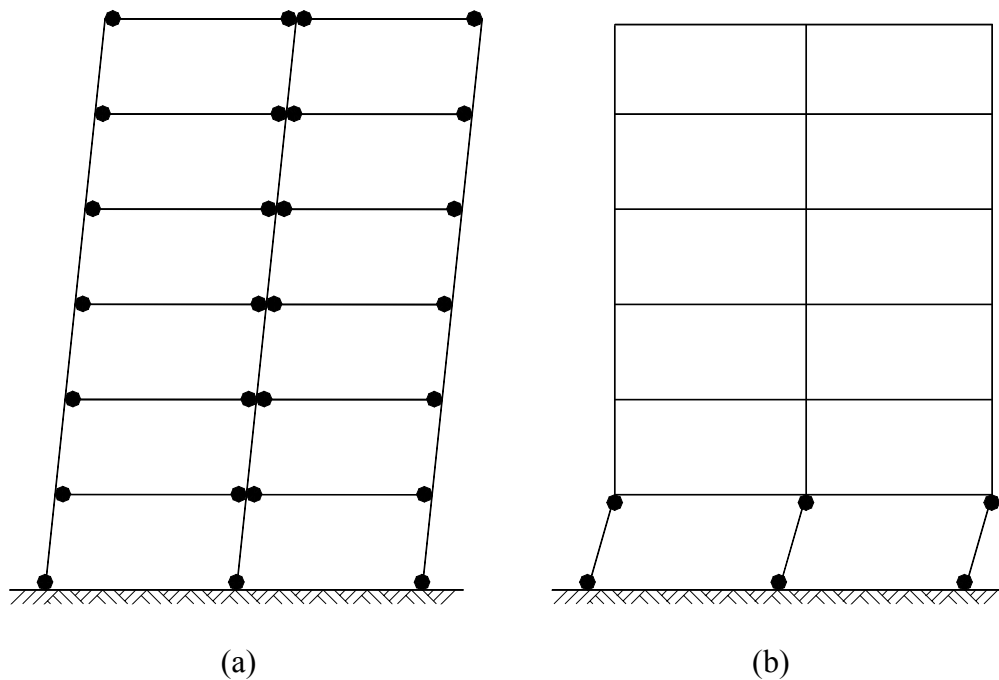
Plastic collapse mechanisms: (a) beam sway; (b) column sway (soft story)
